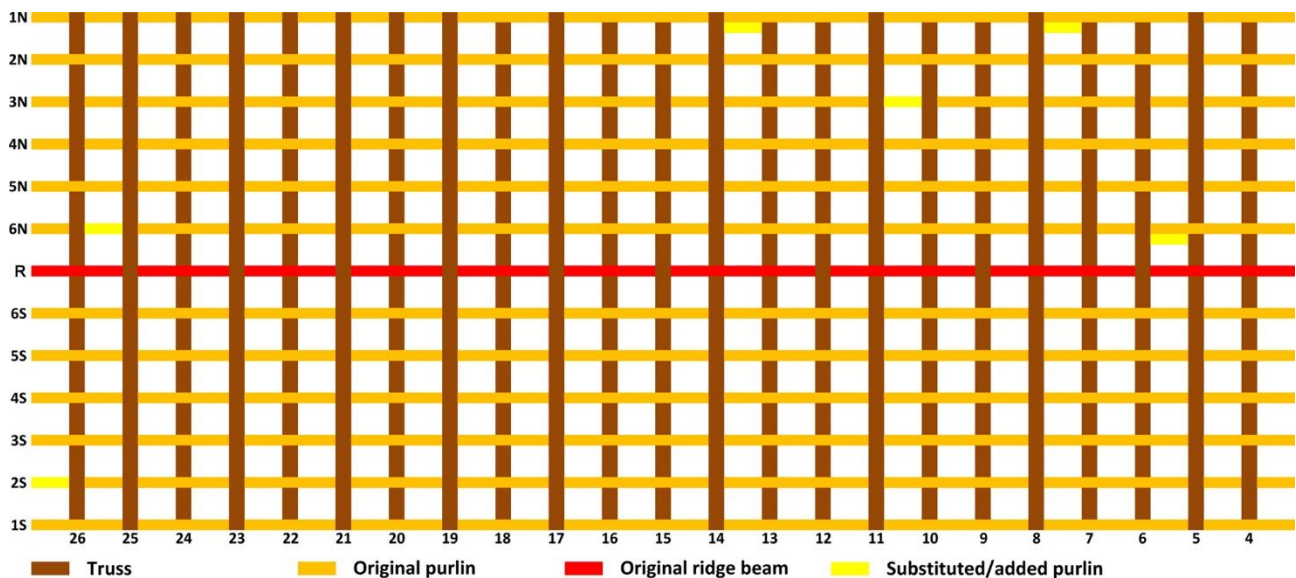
Planimetric scheme of the purlins of the roof of the nave.
